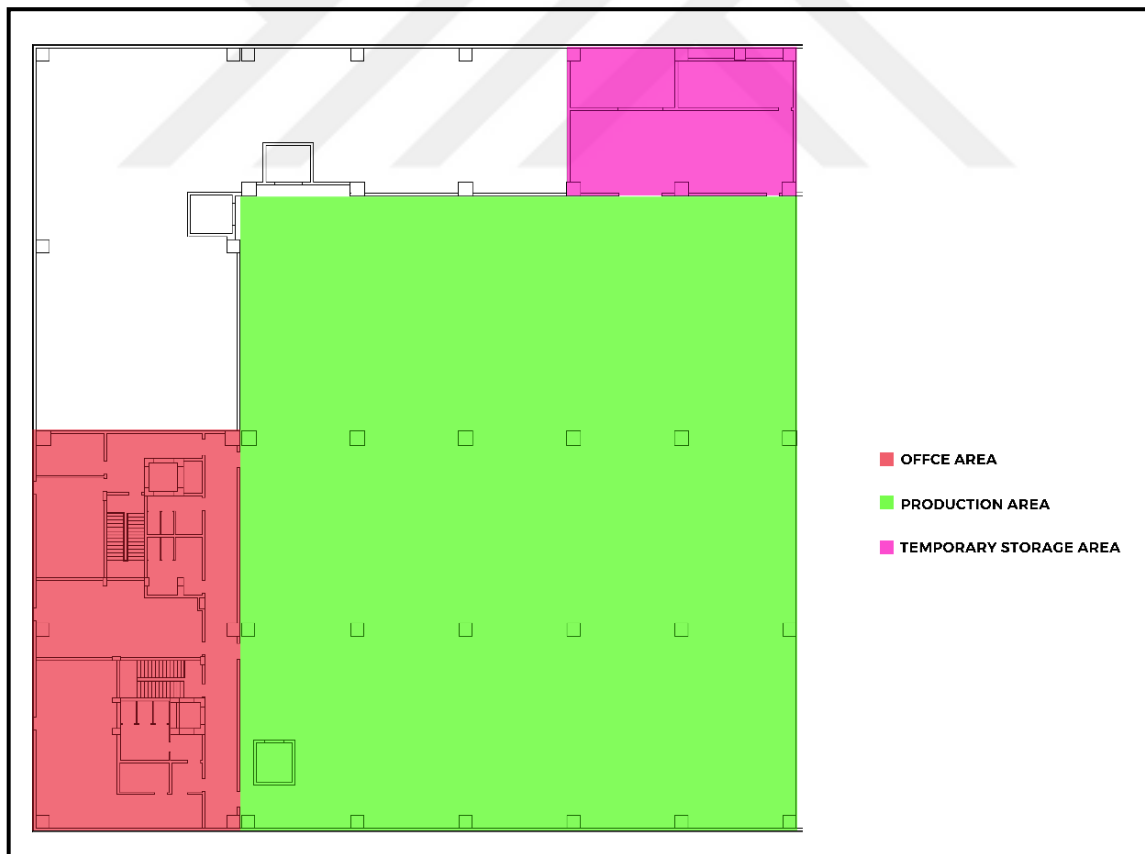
General Arrangement of Different Spaces on the Ground Floor. (First Floor).
